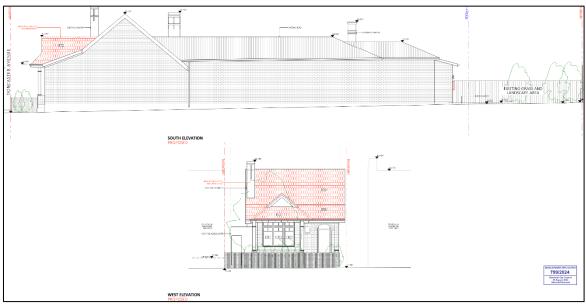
Extract of proposed West and South Elevation Plan (Source: B Studio).
